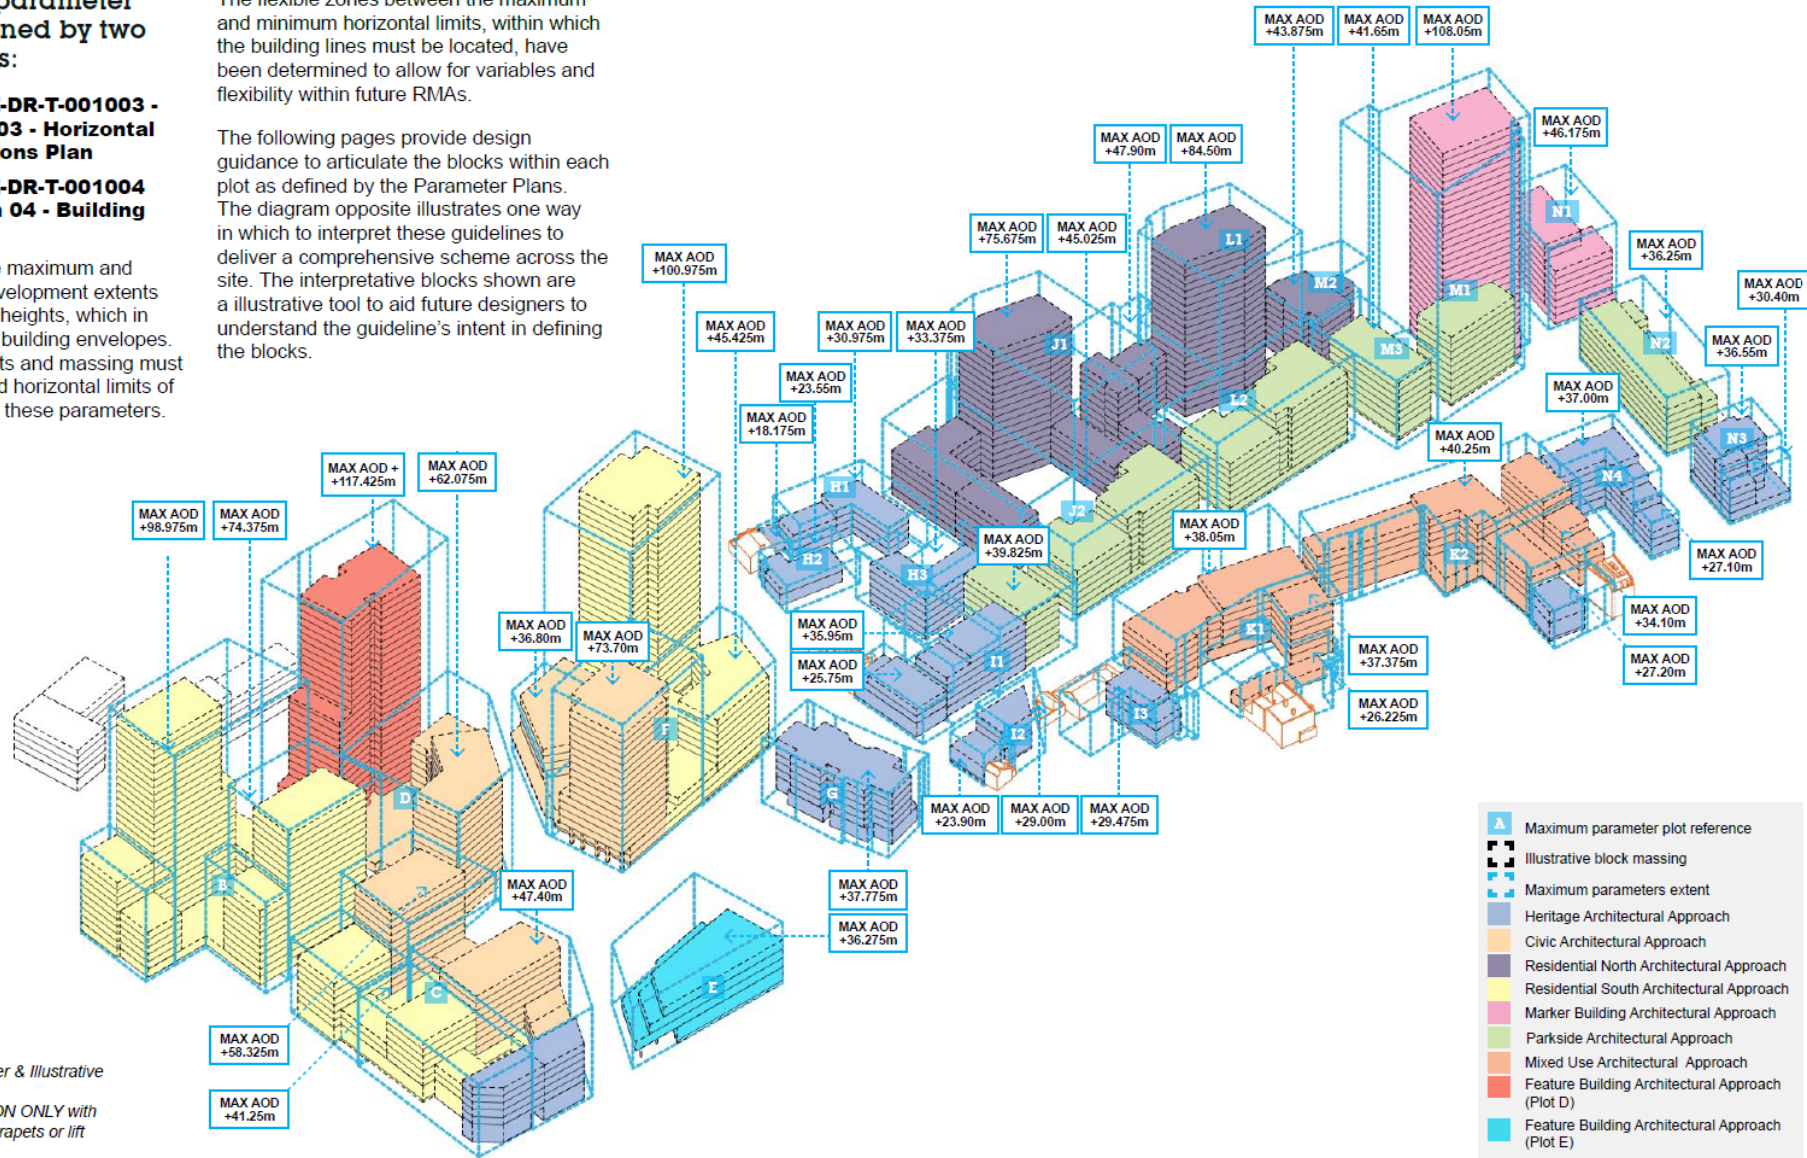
Maximum Parameter & Illustrative Massing Overlay (FOR INFORMATION ONLY with no rooftop plant, parapets or lift overruns shown)
